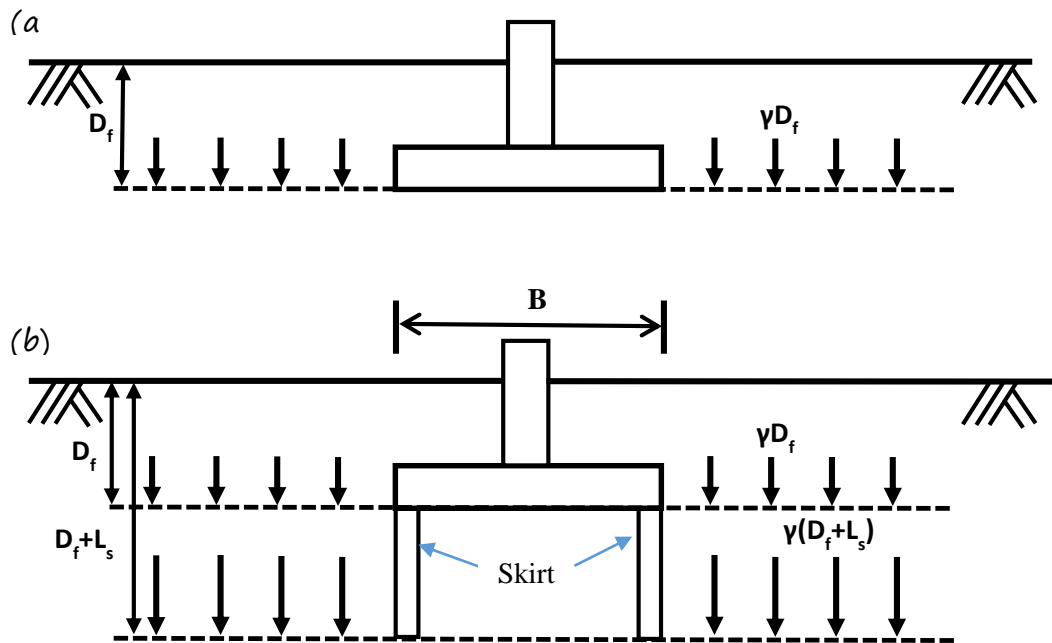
Schematic diagrams illustrating the differences between shallow and skirted footings: (a) conventional shallow footing; (b) typical skirted footing, in which external skirt elements are attached to the edges of the conventional footing
